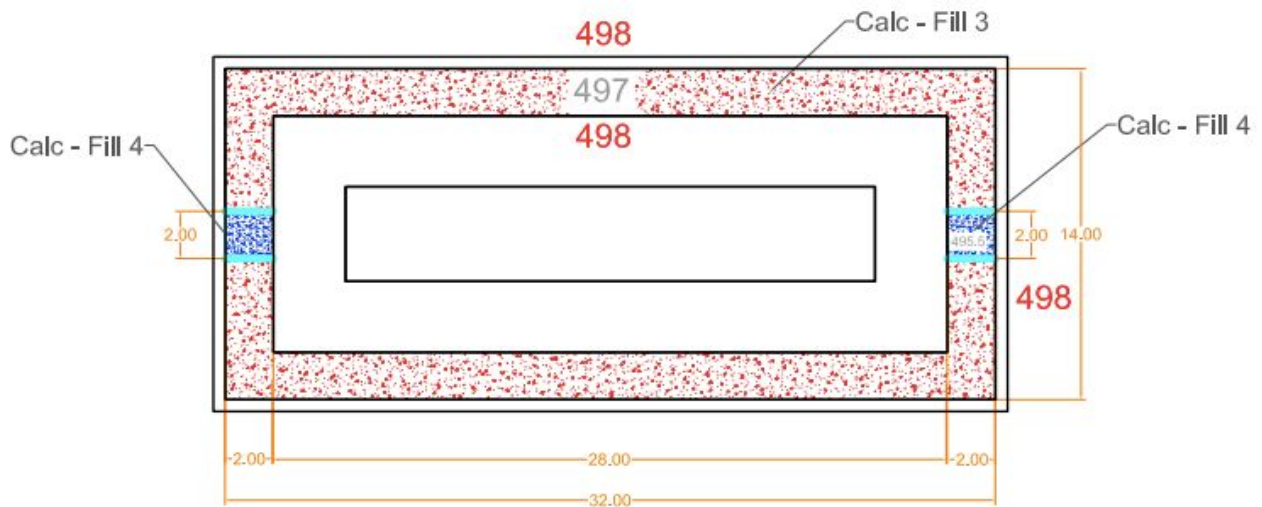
The area corresponding with Fill 3 and 4 calculations reported in Table 6. Grey numbers are current elevations and red proposed elevations. All dimensions are in feet.
